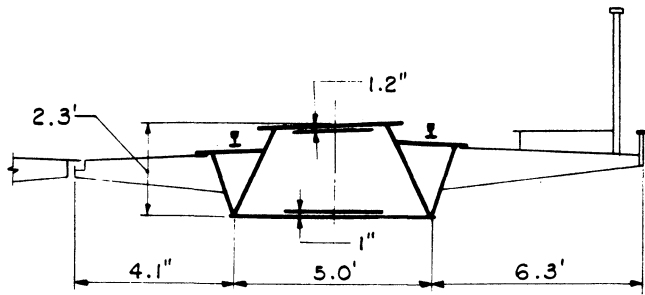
Railroad bridge over Autobahn, Kirchweyhe (Bremen), Germany. Spans 56 ft-56 ft. The rails bear directly on the steel box without use of ties or ballast. Each box is fully shop prefabricated
